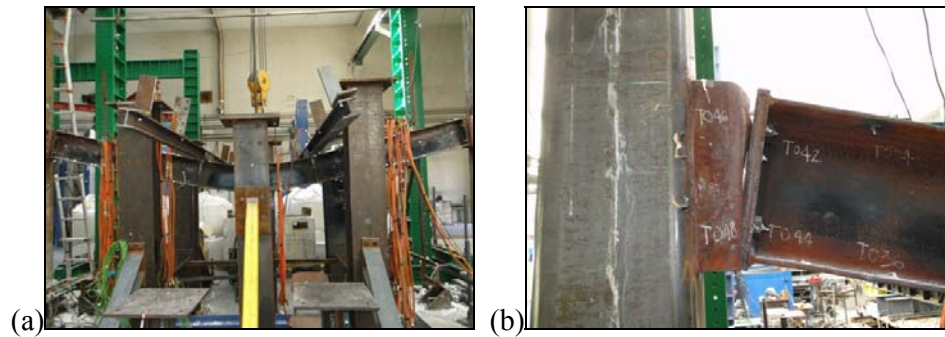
Deformed Shape in the Test 6: (a) Beam; (b) Connection
